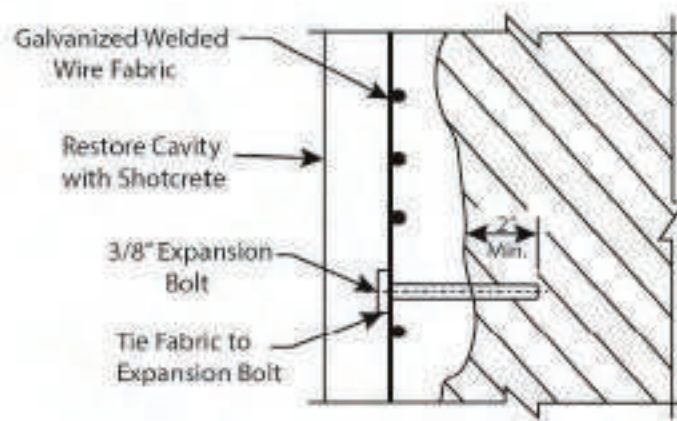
Welded Wire Fabric Anchorage for Shotcrete
